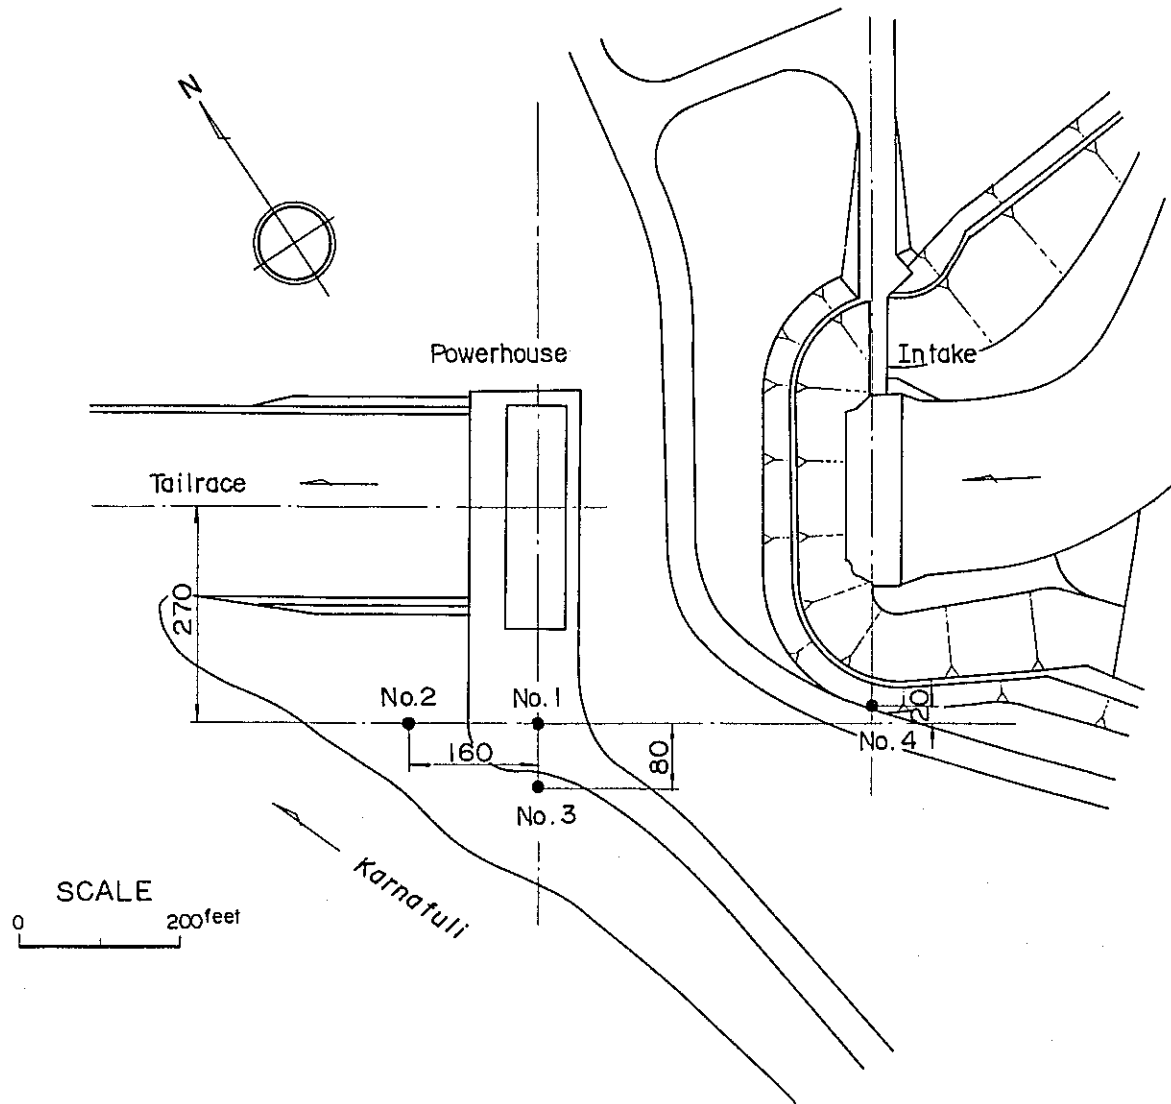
LOCATION OF DRILL HOLES (EPWAPDA)
